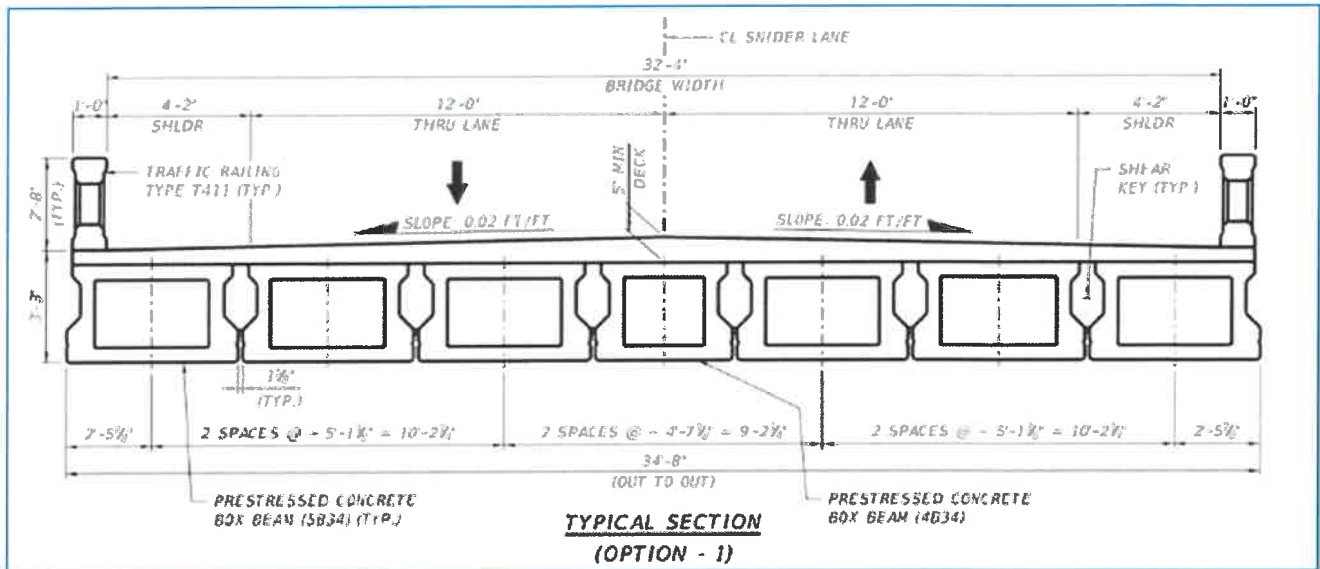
TxDOT Prestressed Concrete Box Beams (5B34 & 4B34) Typical Section
